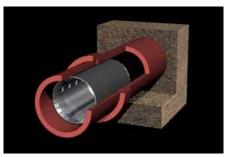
Internal Mechanical Sleeve (Courtesy Link Pipe)
